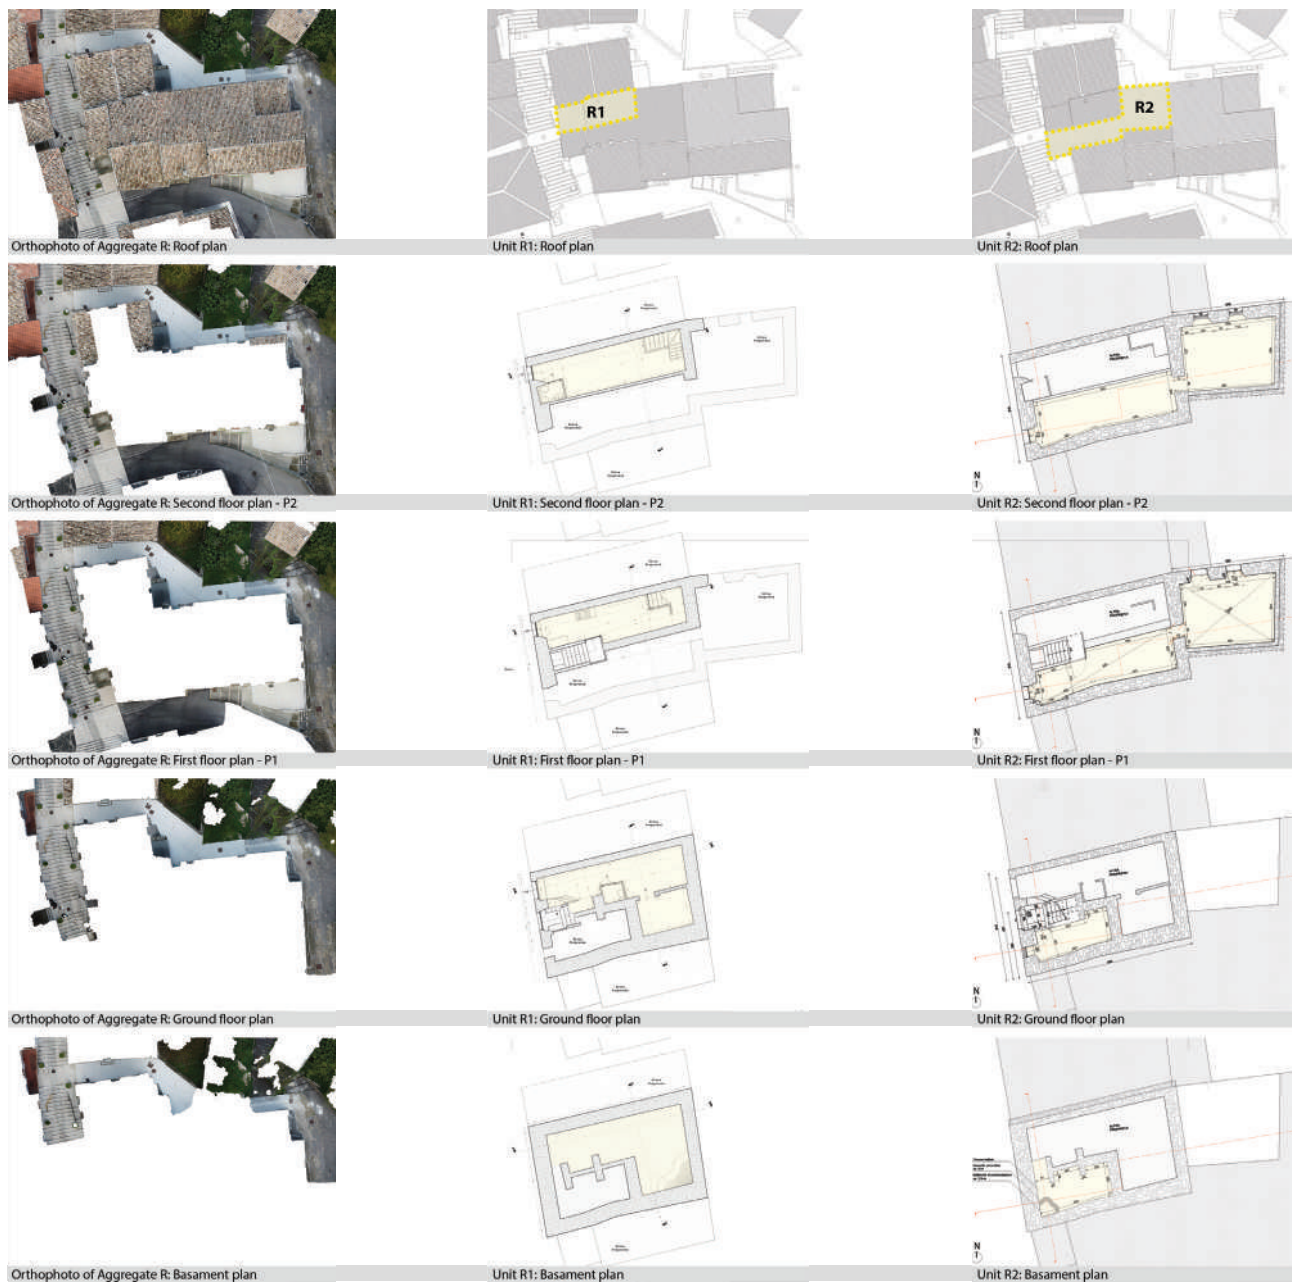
Redrawn of plans merging orthophotos and traditional survey, from left to right: orthophotos of aggregate R, redrawn of unit R1 and R2. From up to down: from roof to basement plan. (Source: Authors' graphic elaboration).
